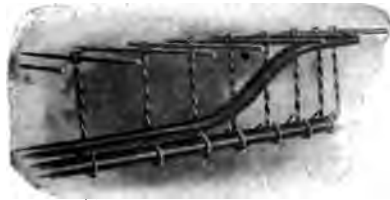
Girder and Slab Reinforcement, Reinforced Cement Construction Co.'s System.
